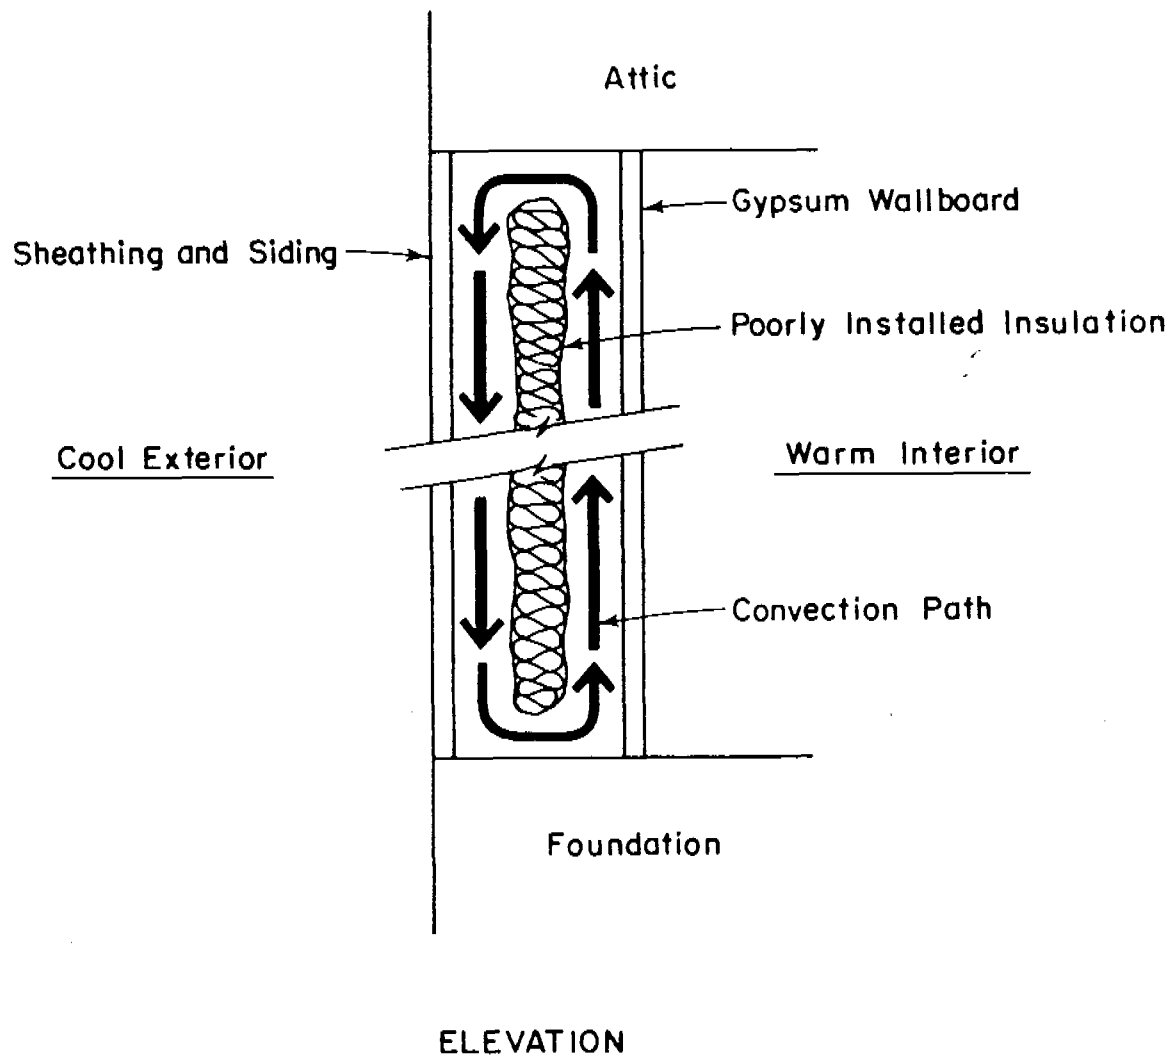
Thermal Bypass Through Poorly Insulated Frame Wall (Adapted from Ref. 5)
